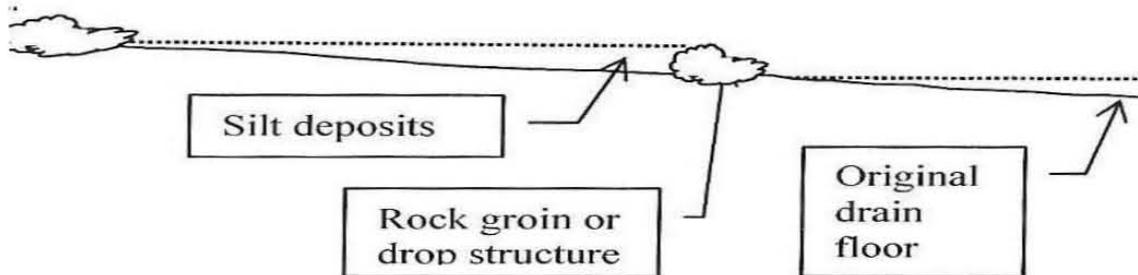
Queensland Department of Primary Industries (DPI) recommended method of sediment trap construction
